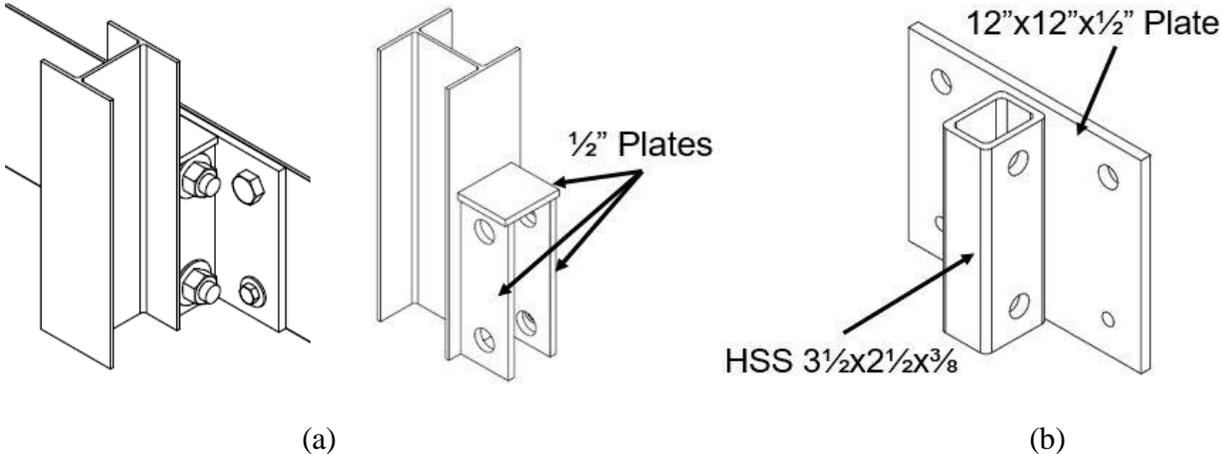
Welded Plates and Shear Bolts Concepts: (a) Post Assembly and (b) Spacer Assembly
